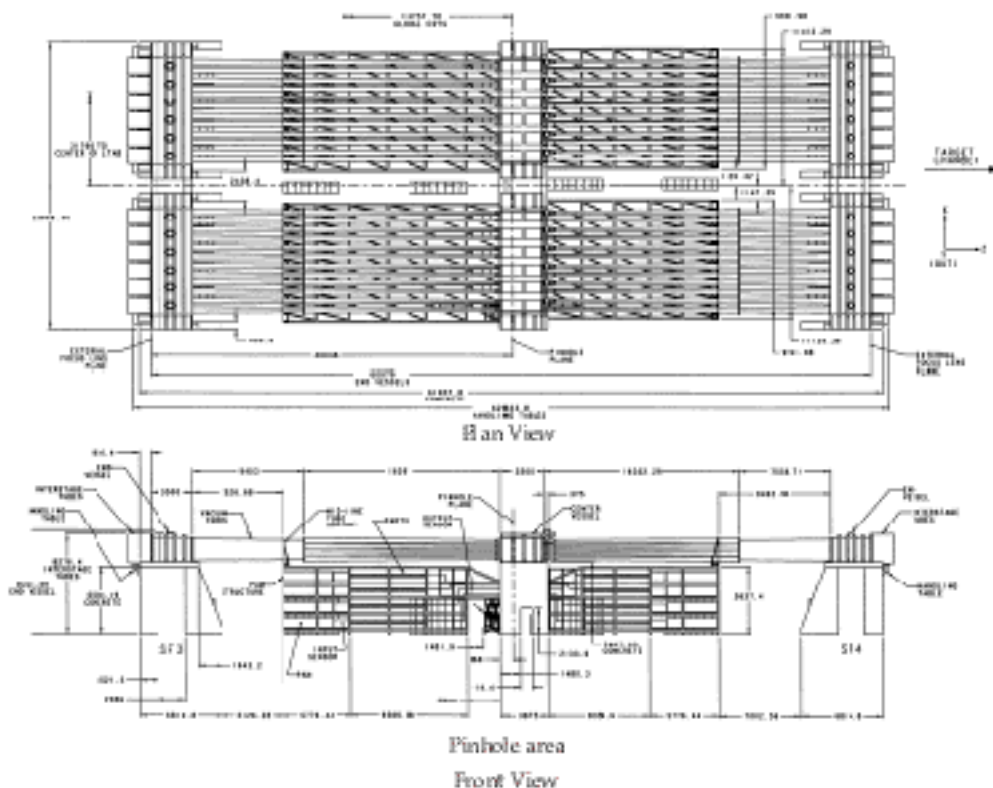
Plan and elevation of the TSF support structure. All distances are in millimeters. (40-00-1097-2296pb01)
